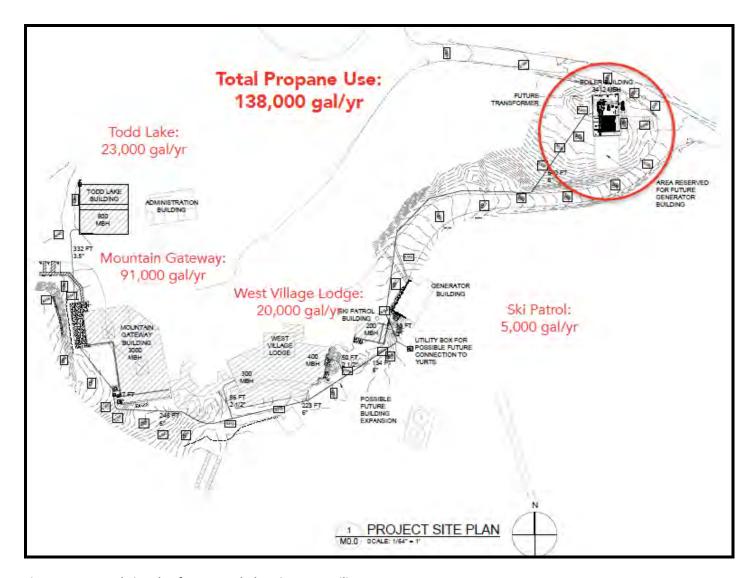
Map and Site Plan for Mt. Bachelor Biomass Facility
